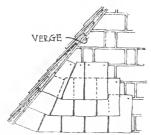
This drawing, referred to on page 111, shows the verge at a gable end. The projecting tiles should have a soffit course bedded flat, and be jointed in cement. Tile-hanging is also shown here nailed to brick-on-edge.
